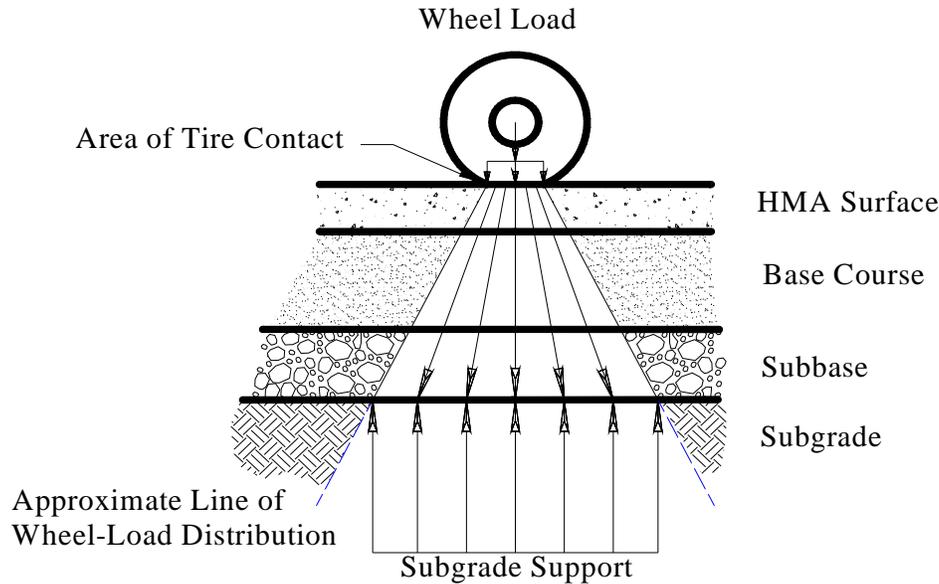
5. Distribution of Wheel Load in Flexible Pavement
